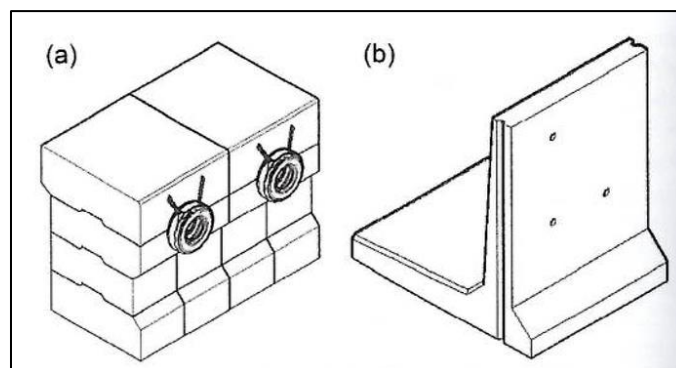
Block seawall and L-wall element (Alexander, 2016)
